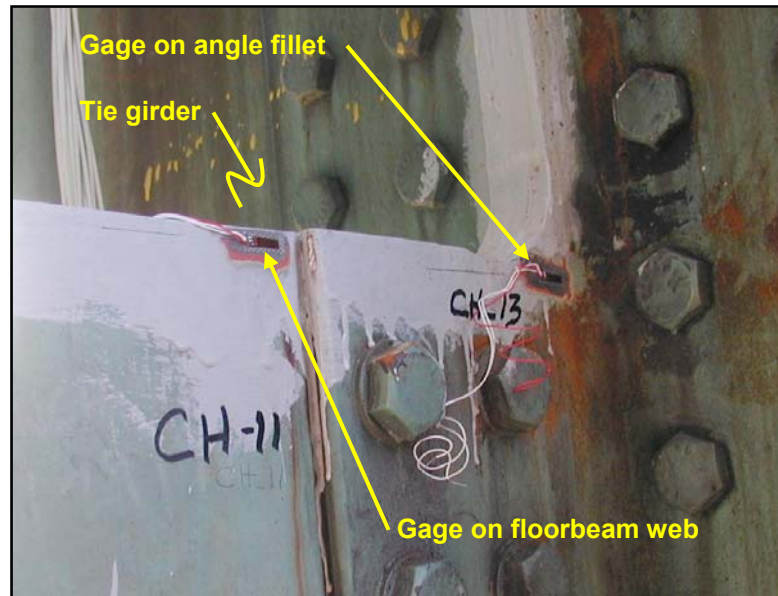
Photograph of strain gages installed near floorbeam connection angles
